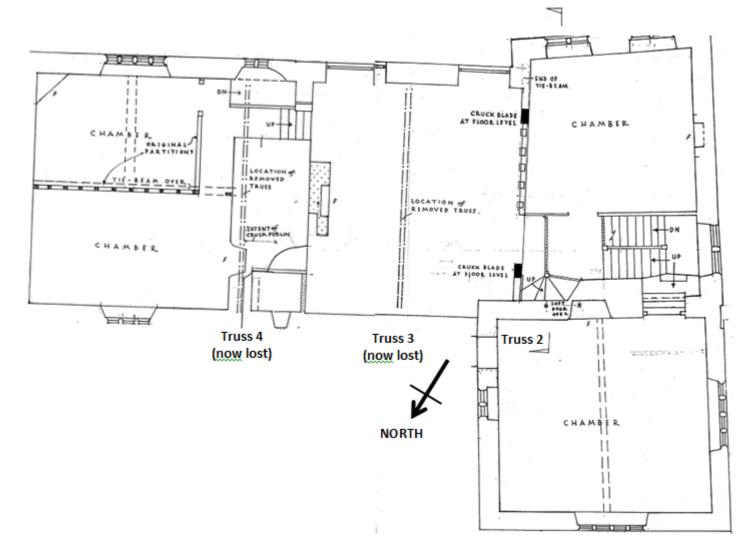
First floor survey plan of Dronfield Woodhouse Hall (after Stanley Jones 1990)
